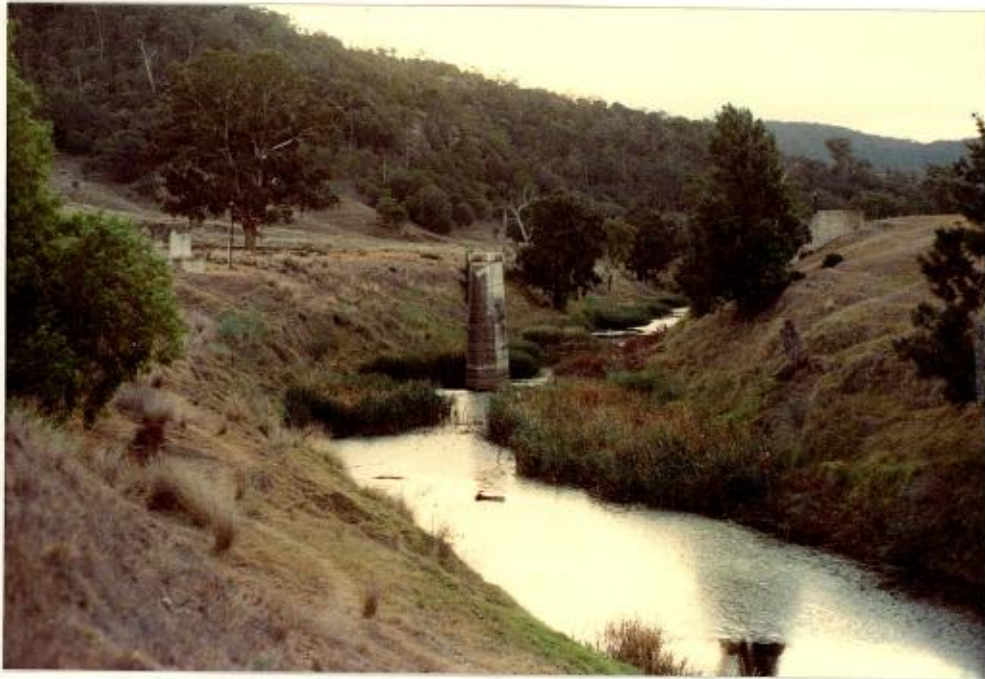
(1) Halls Creek Bridge (Bridge No. 1)
